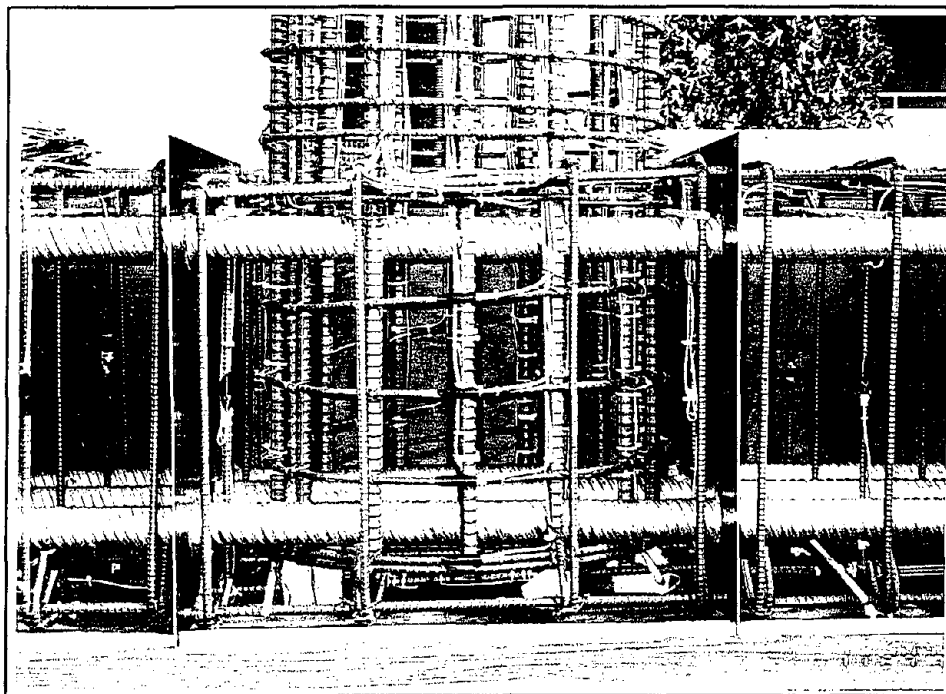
Joint reinforcement of test unit IC3 with a fully prestressed cap beam.
